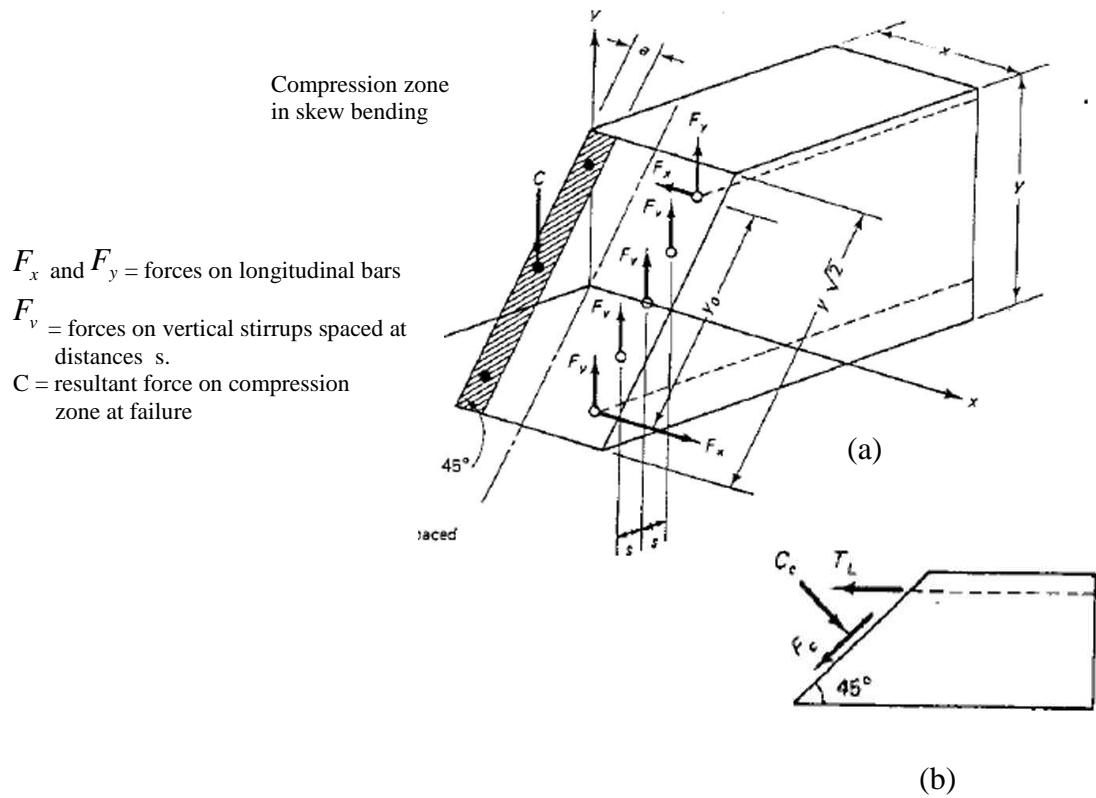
Forces on the skewly bent planes: (a) all forces acting on skew plane at failure; (b) vector forces on compression zone Nilson and Winter,(1991).
